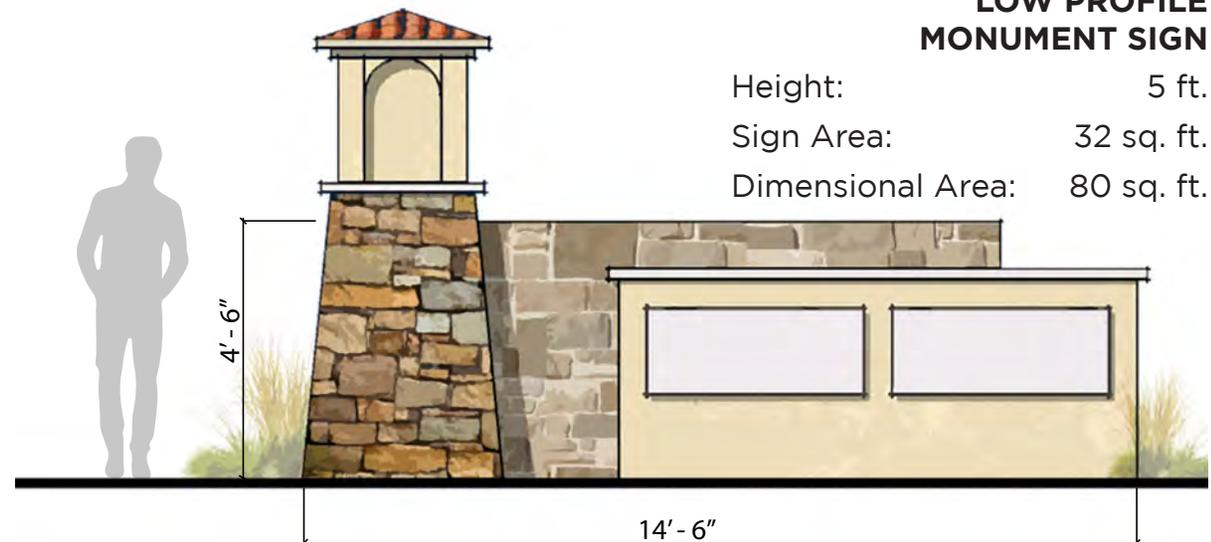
PERIMETER SIGNAGE PLAN
